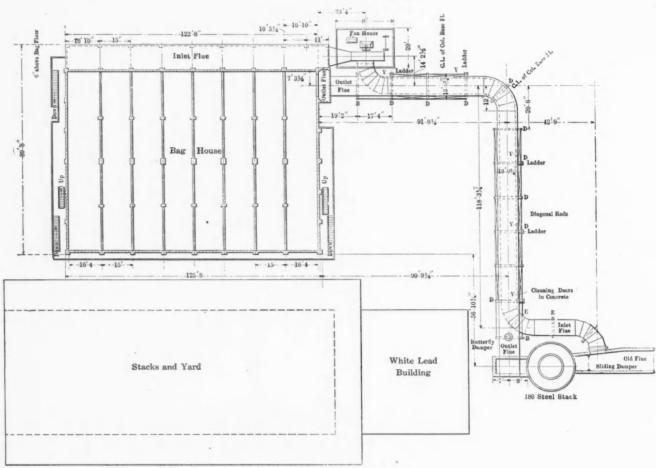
DETAILS OF CONCRETE AND STEEL FLUE TO BAG HOUSE
